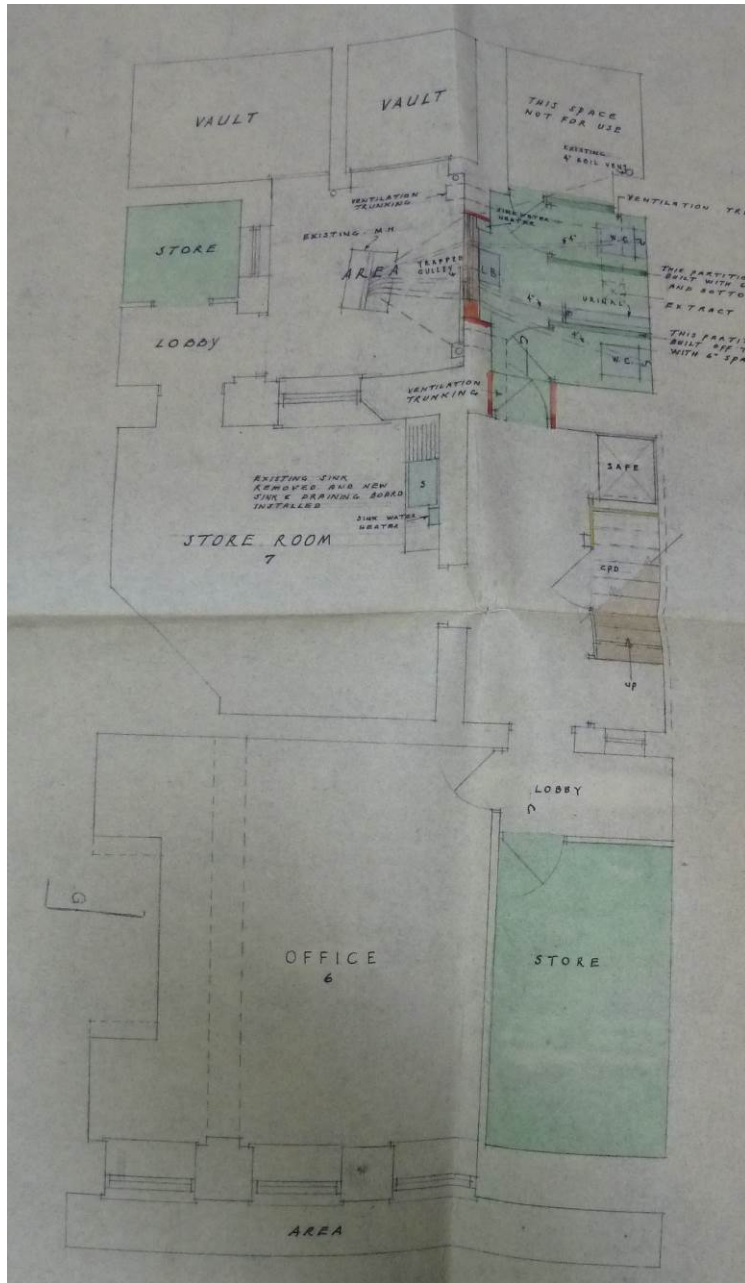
Basement plan, Lawrence Farman & Partners, 1956
